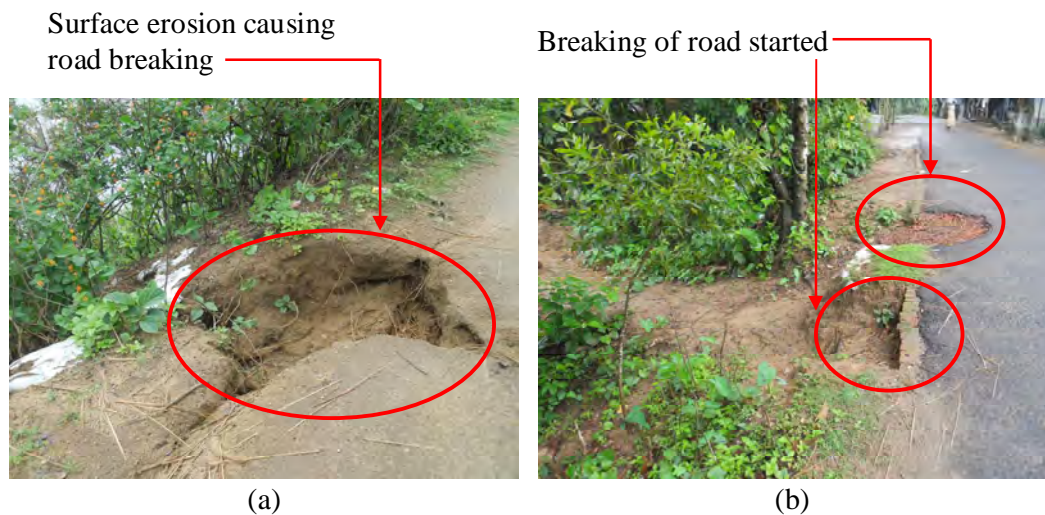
(a) Typical road damage caused by surface erosion and (b) damaged embankment
